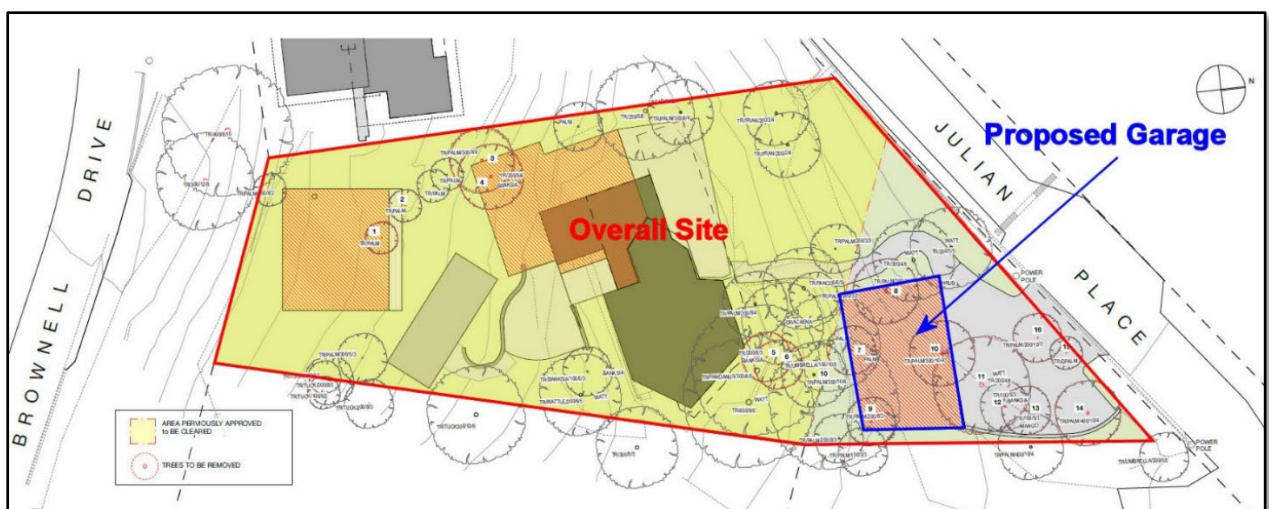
PROPOSED DEVELOPMENT LAYOUT – DWG 04, REV A, 4/12/23
